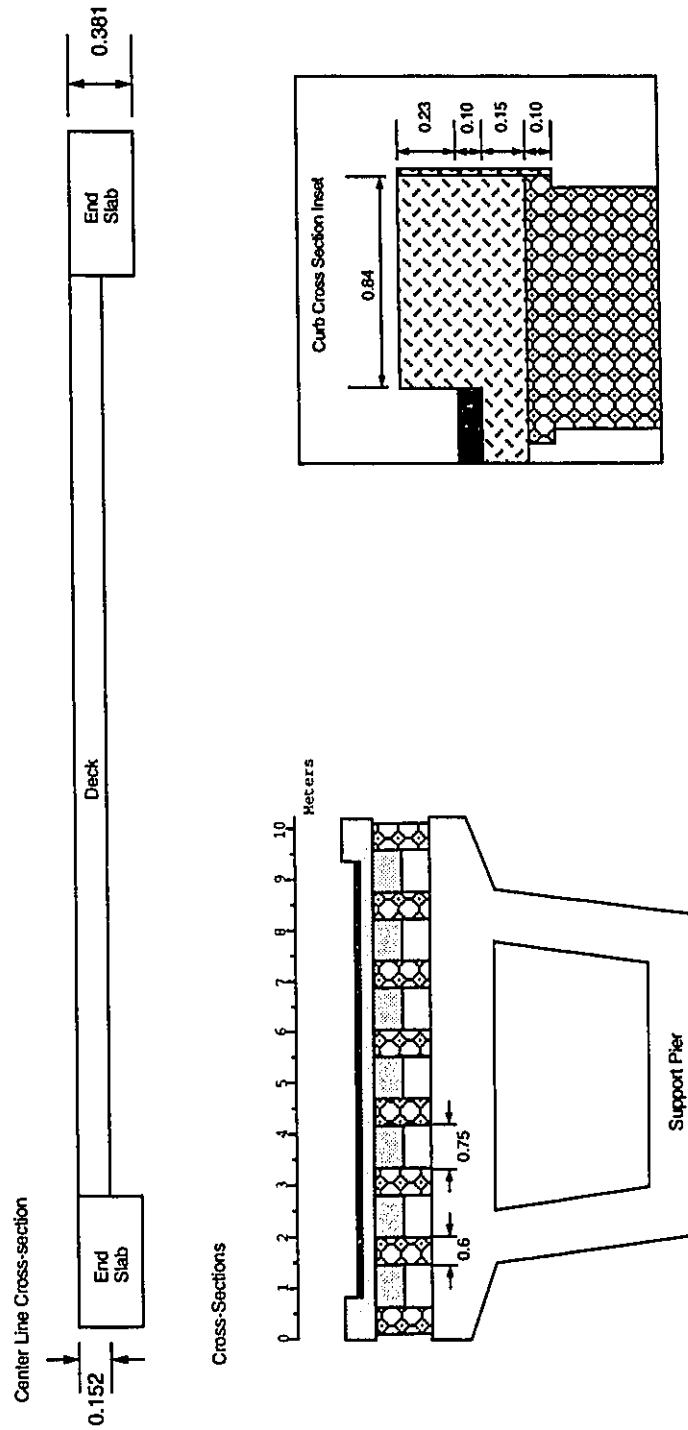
Cobbledick Road Physical Site Plan- Cross-Sections
